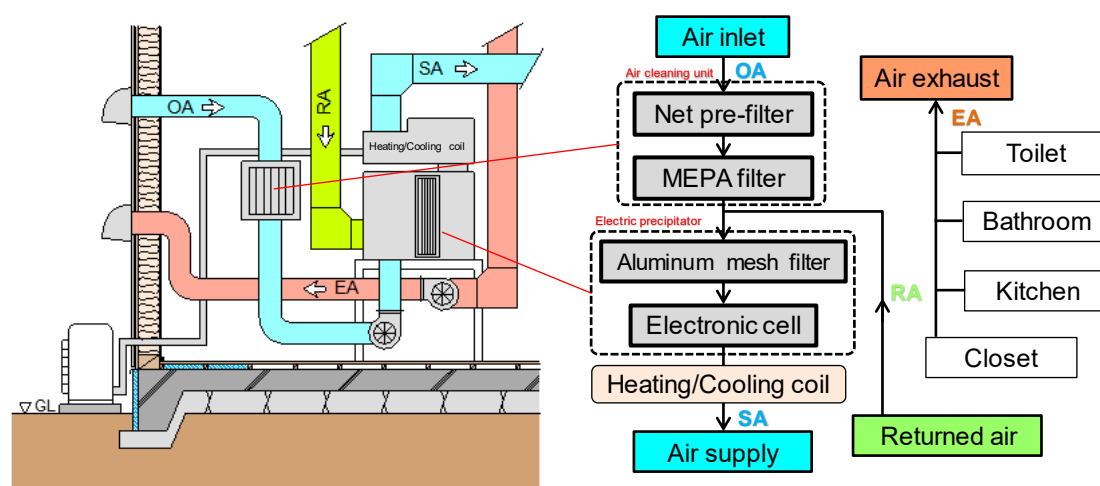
The whole house air-conditioning, ventilation and air-cleaning system
